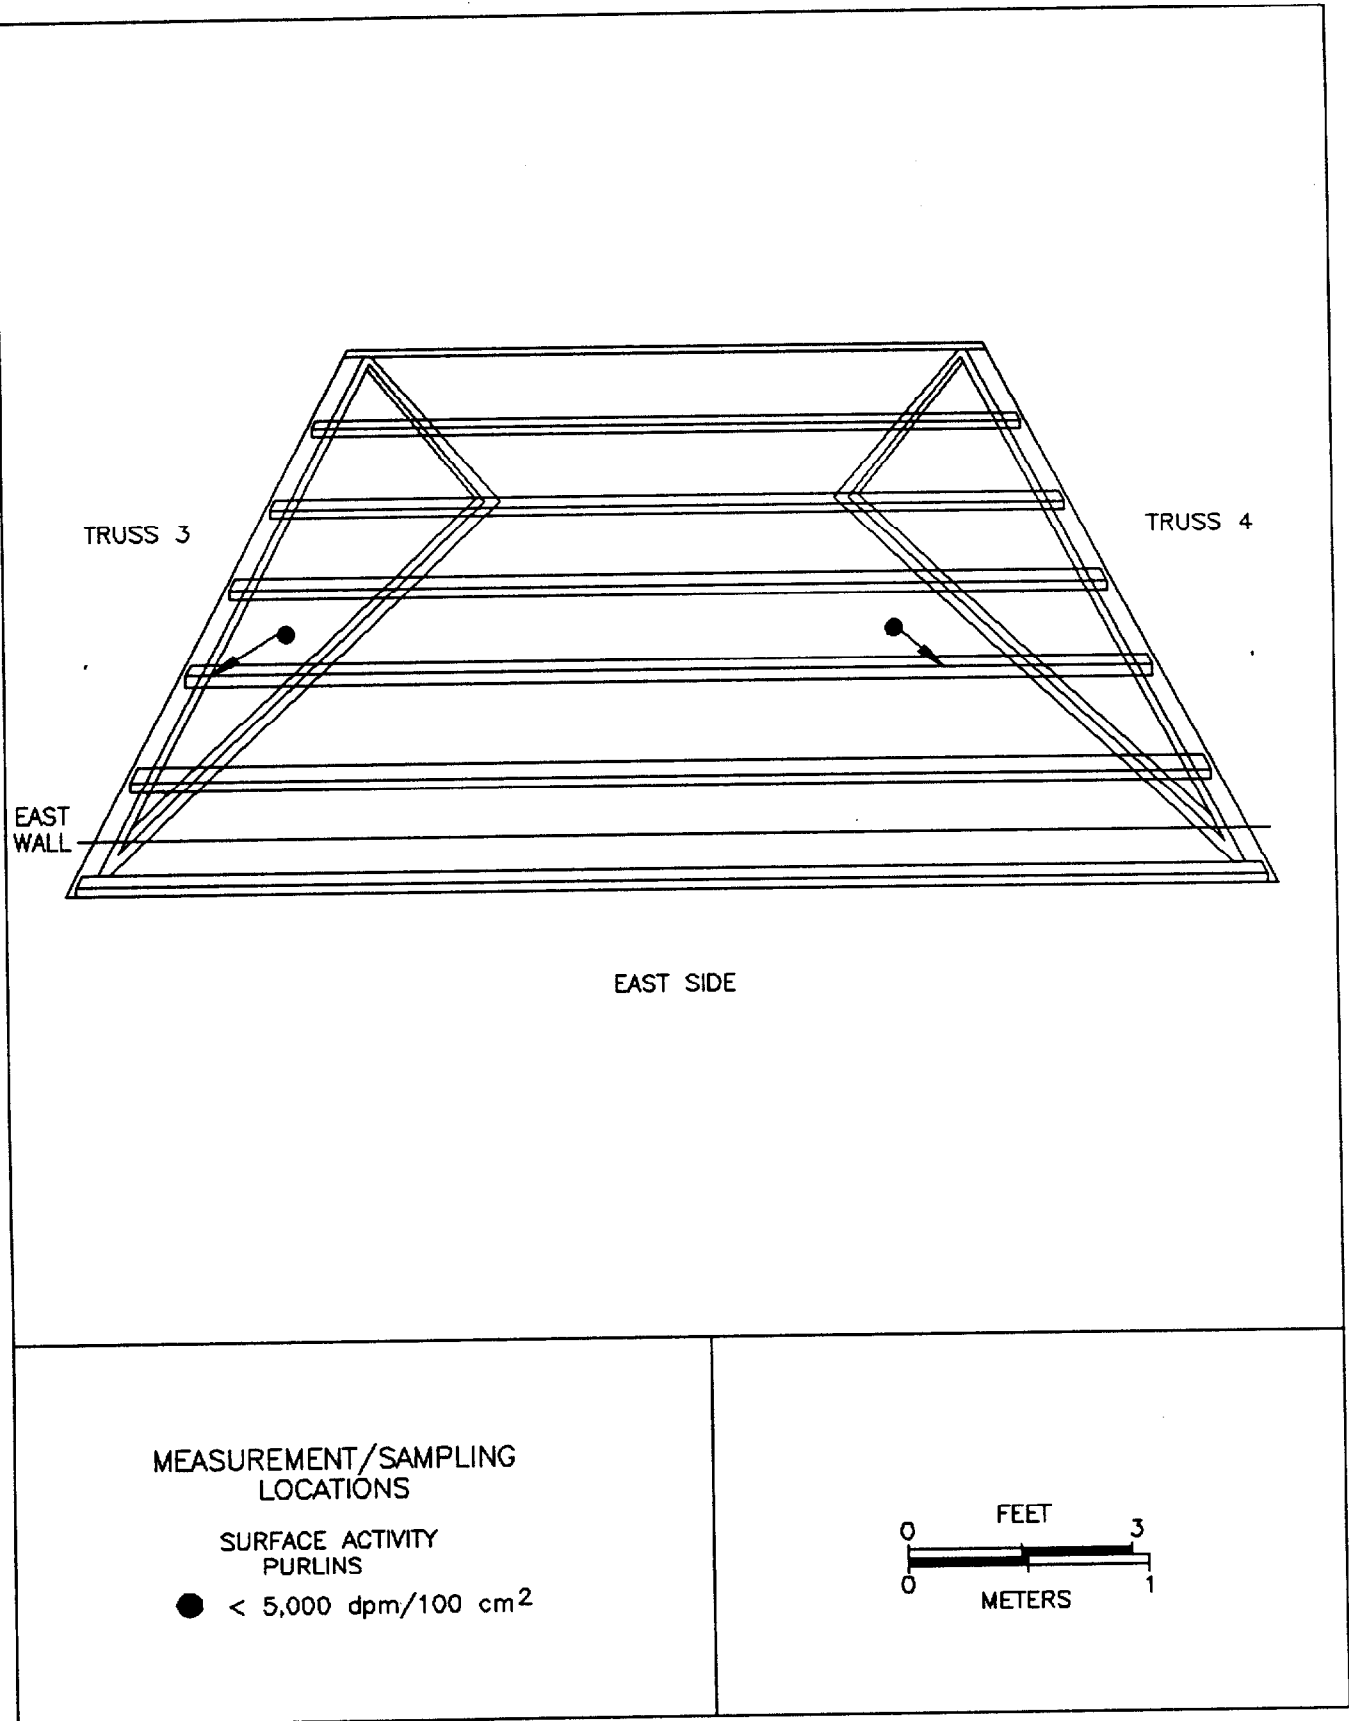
Building 8, Bay 3, East – Measurement and Sampling Locations
